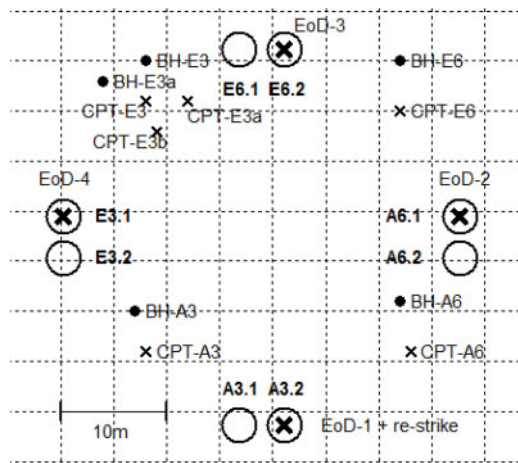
Pile and site investigation layout for Borkum Riffgrund Substation.
